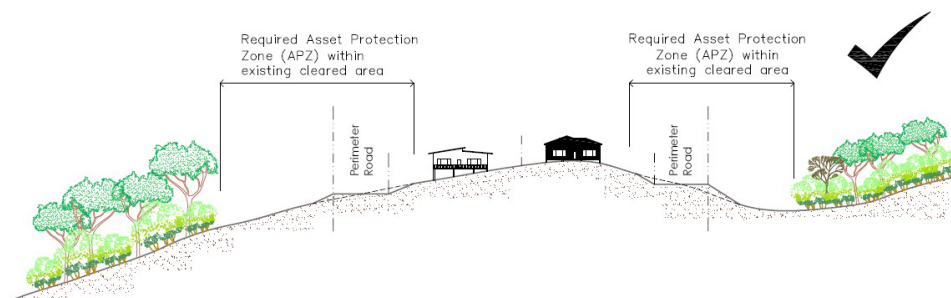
Subdivision layout with Perimeter Road and Asset Protection Zones (APZ)
